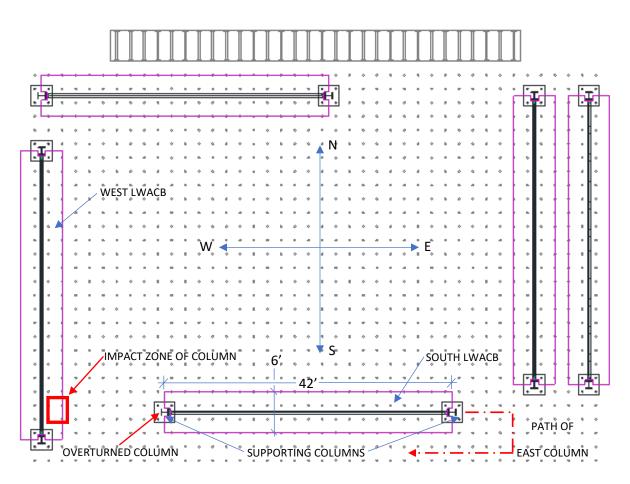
Plan View - Arrangement of LWACB Test Specimens
